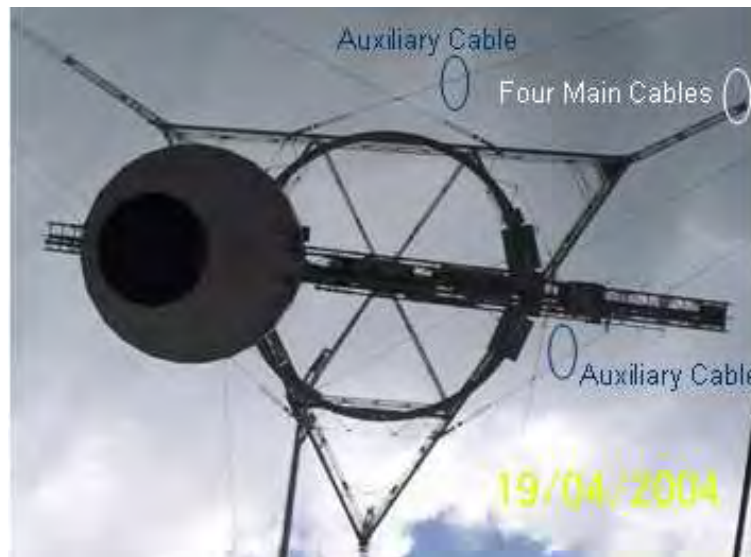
Attachment points of cables to platform. T4 cables highlighted (photo by author)
